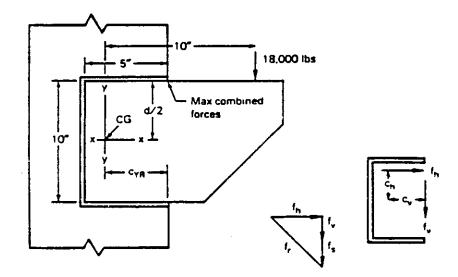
BRACKET JOINED TO A COLUMN FACE WITH A FILLET WELD
